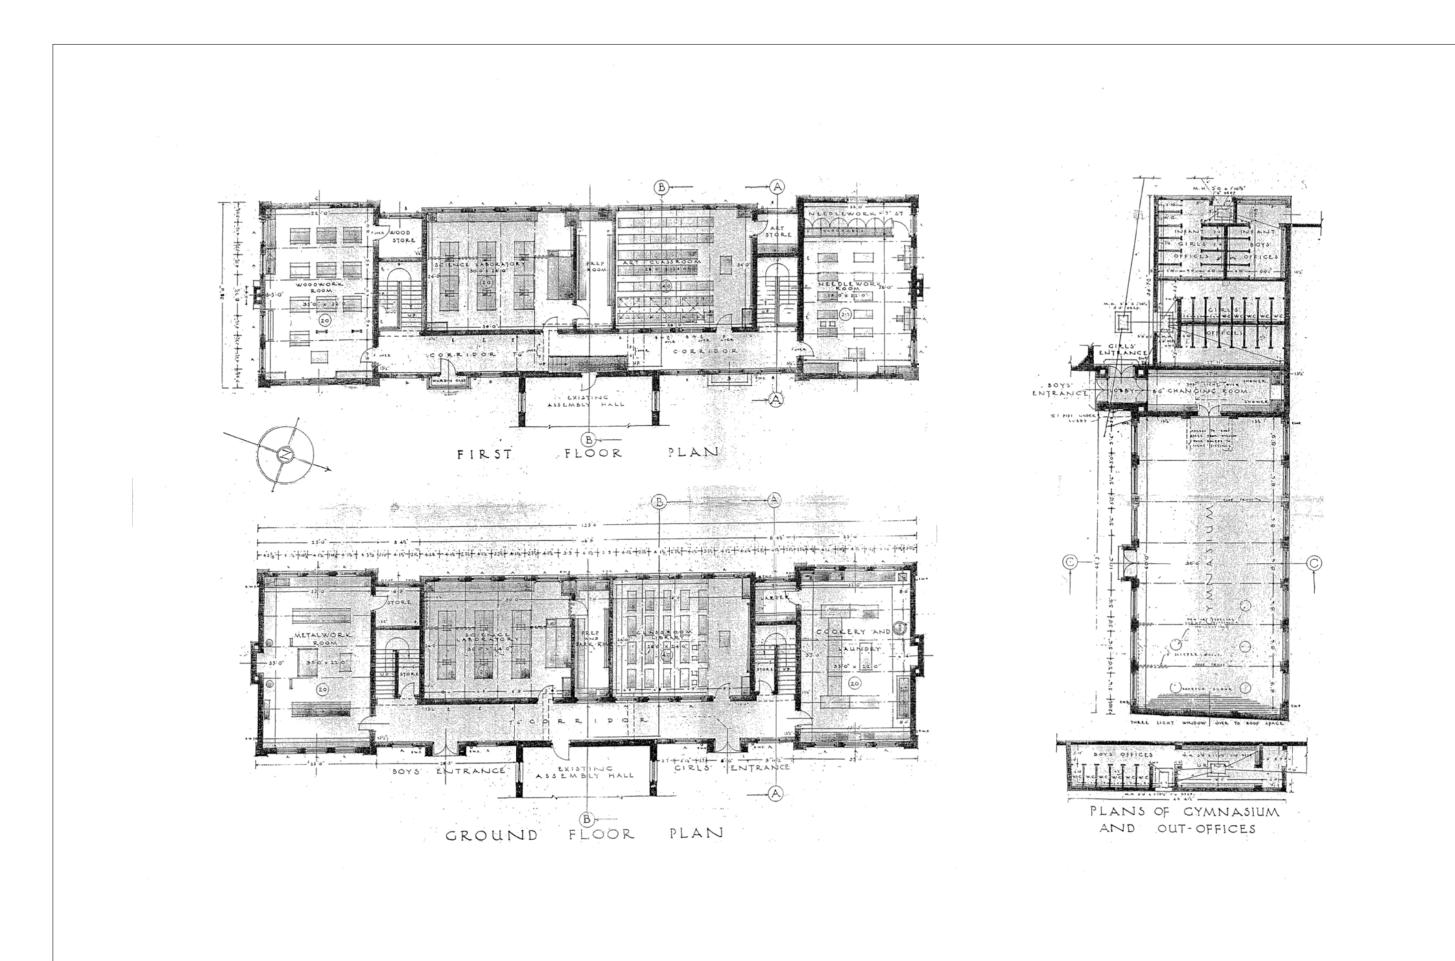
Ground and First Floor Plans, with Plans of Gymnasium and Out-Offices. Walker Gate Council School, Alterations and Additions
